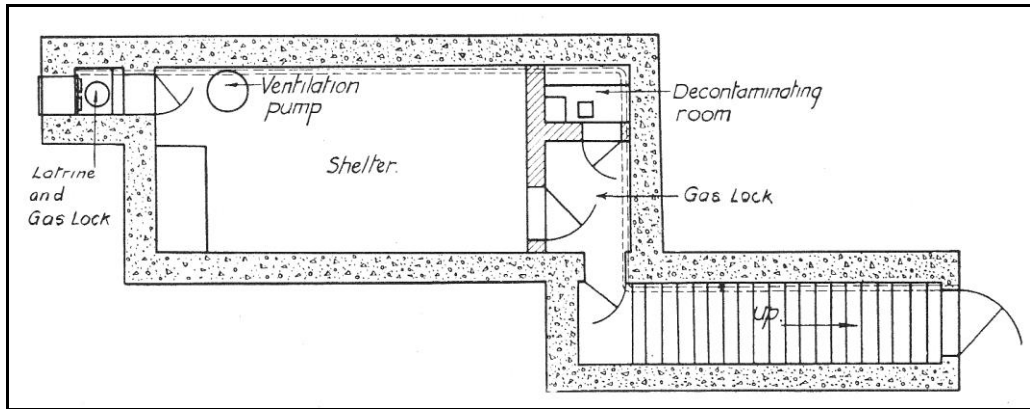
Plan view of bomb proof shelter showing traversed entrance
